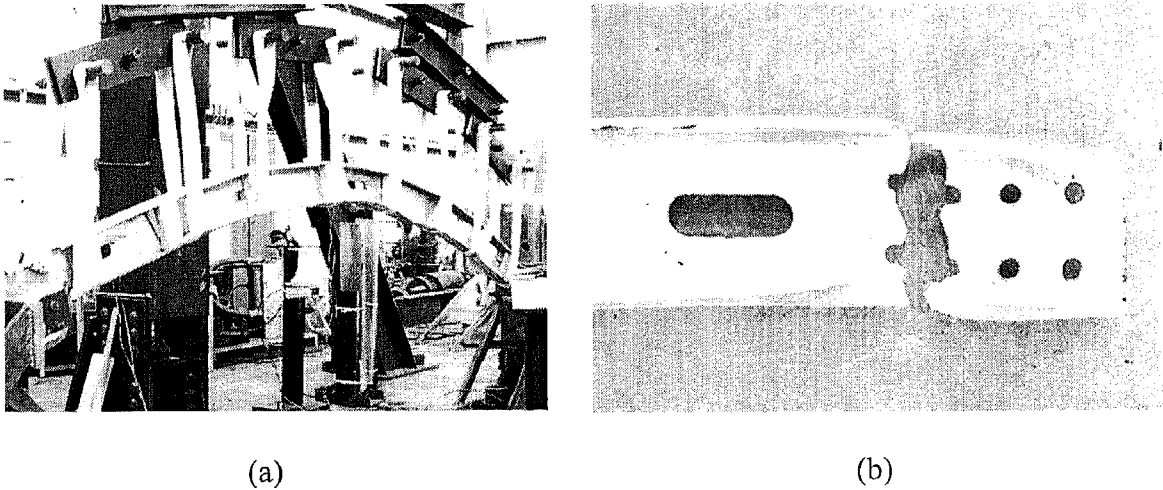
Beam 2 – Steel Angle Test (a) Deformed Shape (b) Connection Failure
